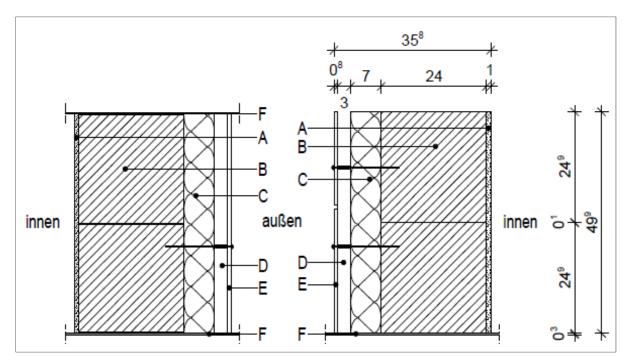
Composite wall construction; single shell masonry of hollow bricks with external heat insulation and ventilated curtain wall;
